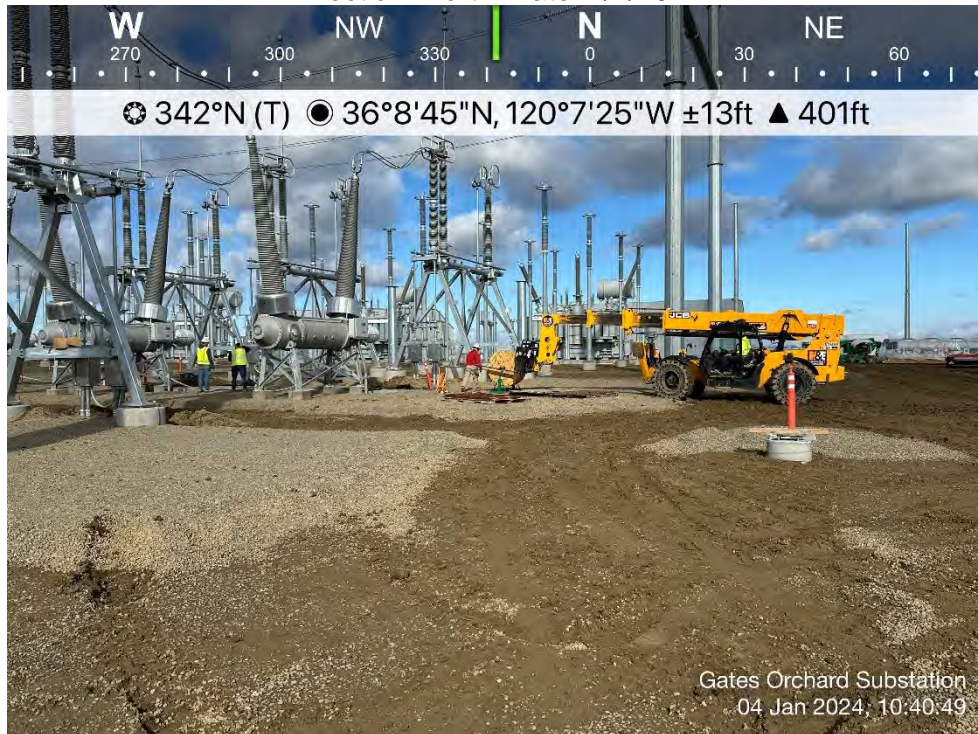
View of crews setting and epoxying anchor bolts for outdoor coolers.
